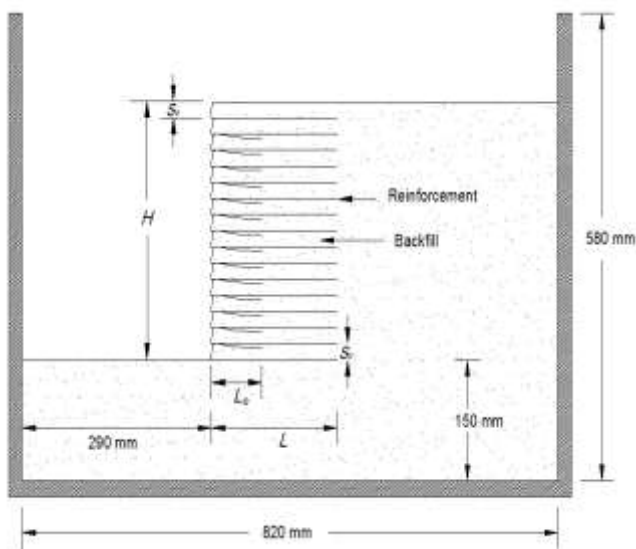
Schematic profile view of a centrifuge GRS wall model (L is the reinforcement length; L_o is the overlap length of reinforcement; S_r is Reinforcement vertical spacing)
